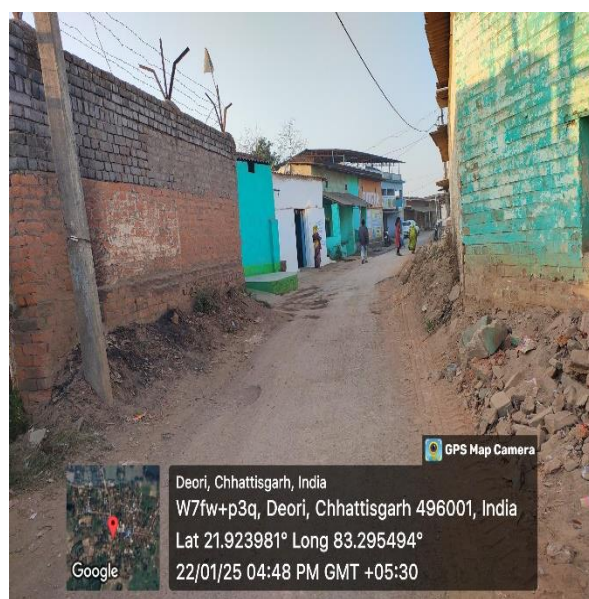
Proposed Pipeline Route Passes through Deori Village
